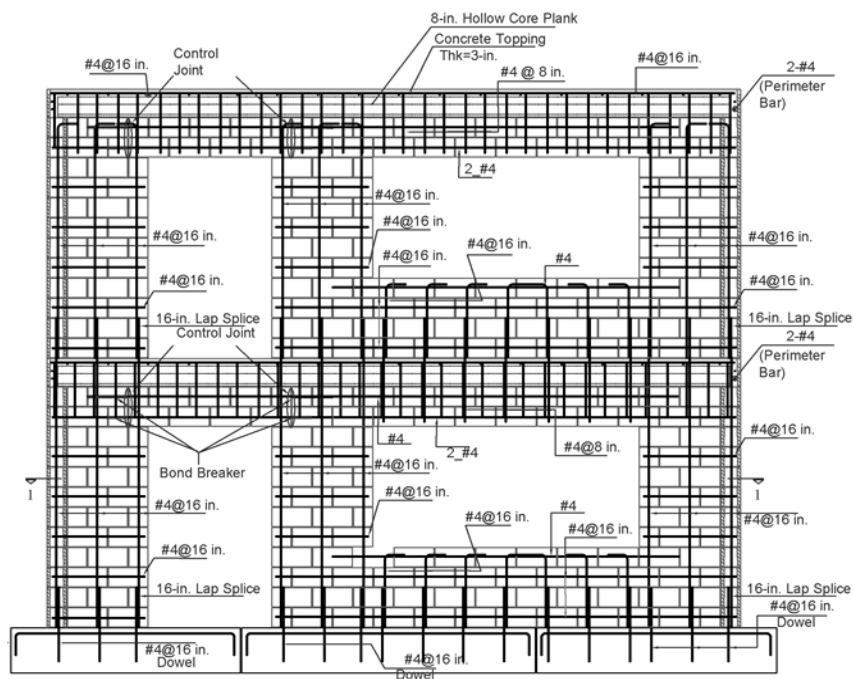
Steel Reinforcement Details of Web Wall Sections. Mavros, M. 2013. Personal Communication. Used under fair use, 2014.
